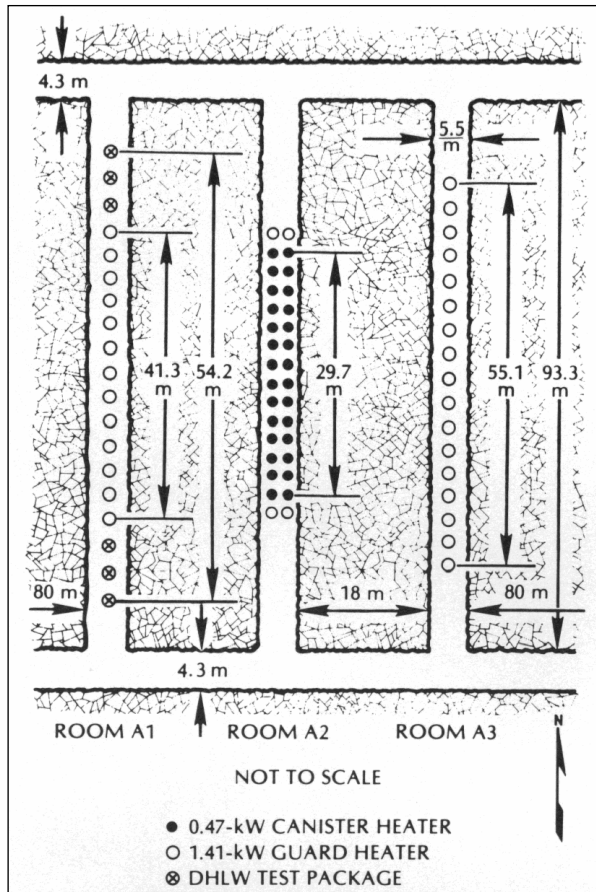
WIPP TSI Rooms A1, A2, and A3 Layout
